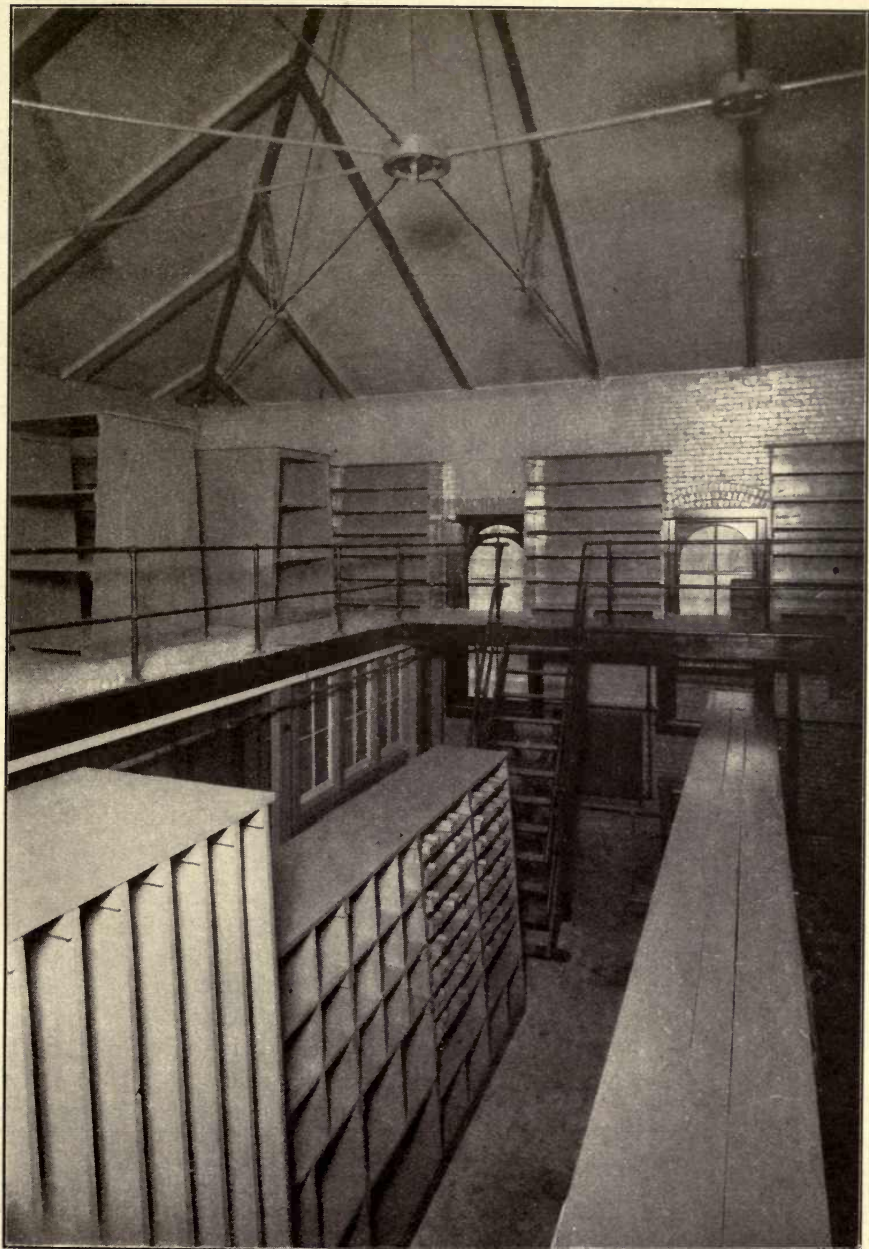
NEW DISTRIBUTING STOREHOUSE—RIDGEWOOD.
